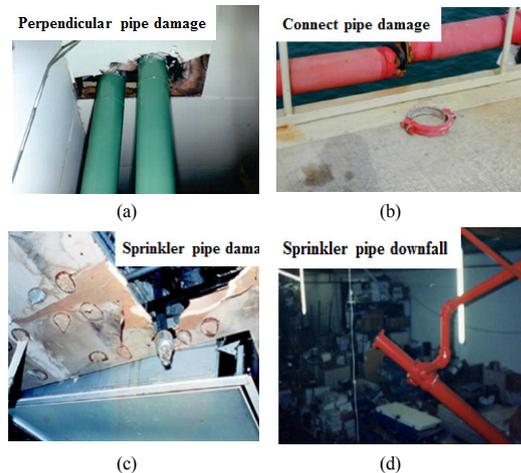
Damage of piping due to earthquake, (a) Perpendicular pipe damage, (b)Connect pipe damage, (c)Sprinkler pipe damage, (d)Sprinkler pipe downfall
